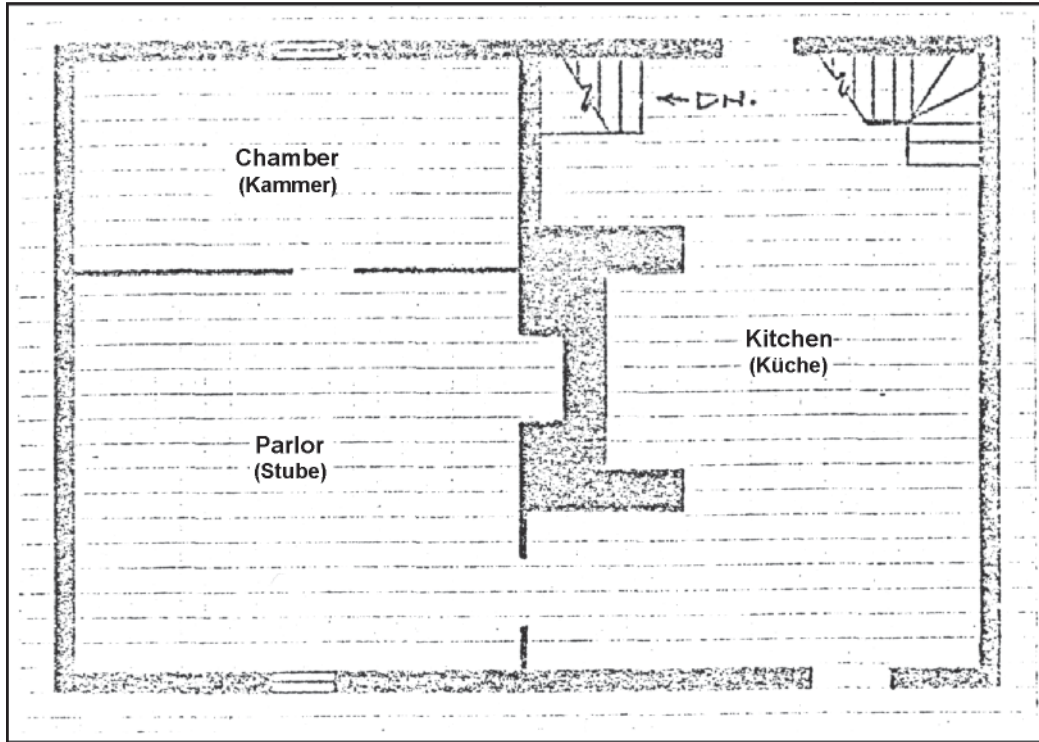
Example of hall-kitchen plan (Chappell 1981).
